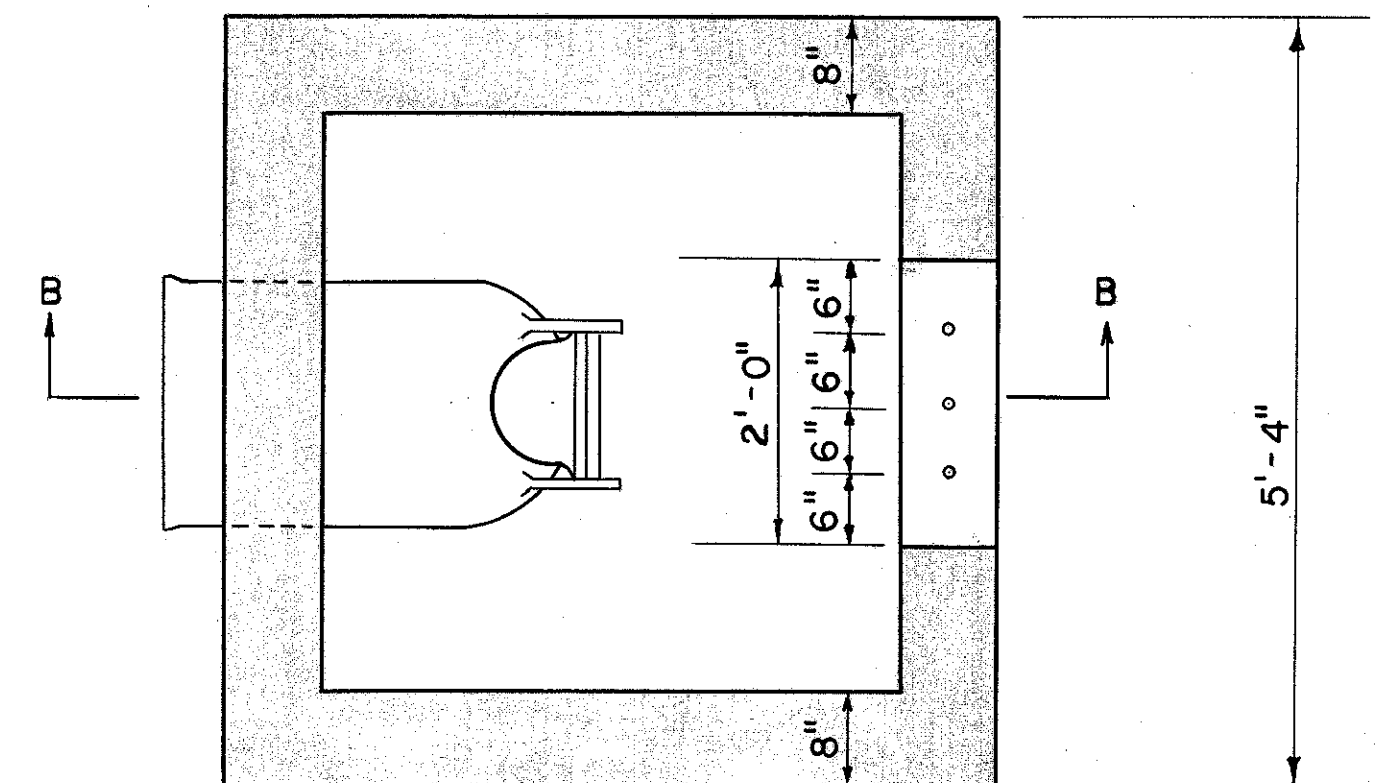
DETAILS OF RENICK RUN MANHOLE AND JUNCTION CHAMBER
